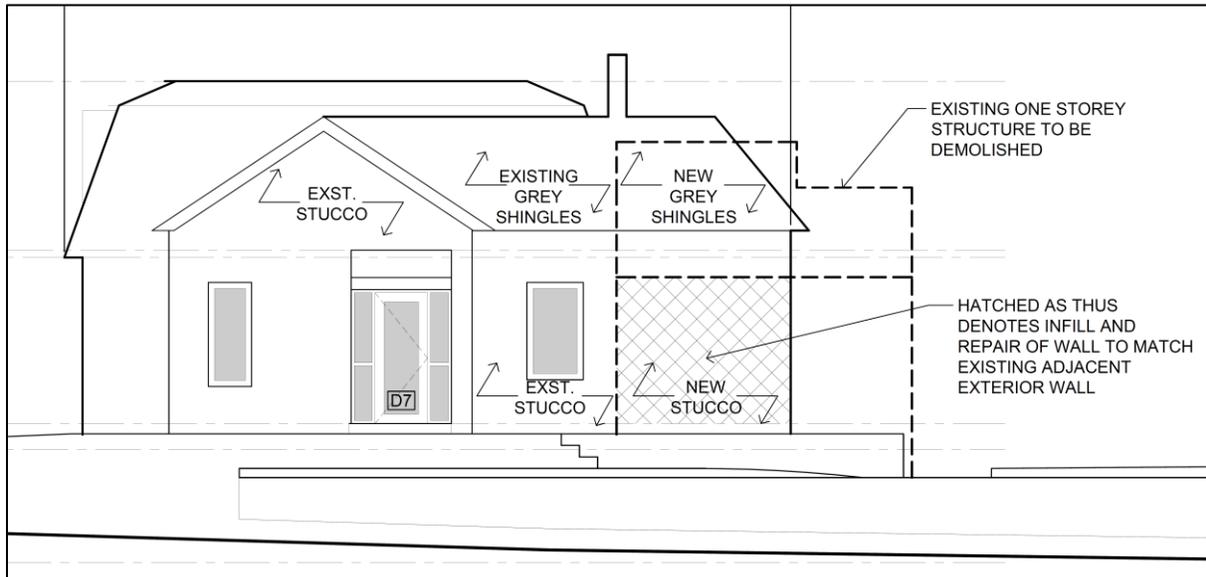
Elevation drawing of the south elevation showing the removal of the Taylor-Froebel House's sunroom (Weiss Architecture and Urbanism Ltd.)
